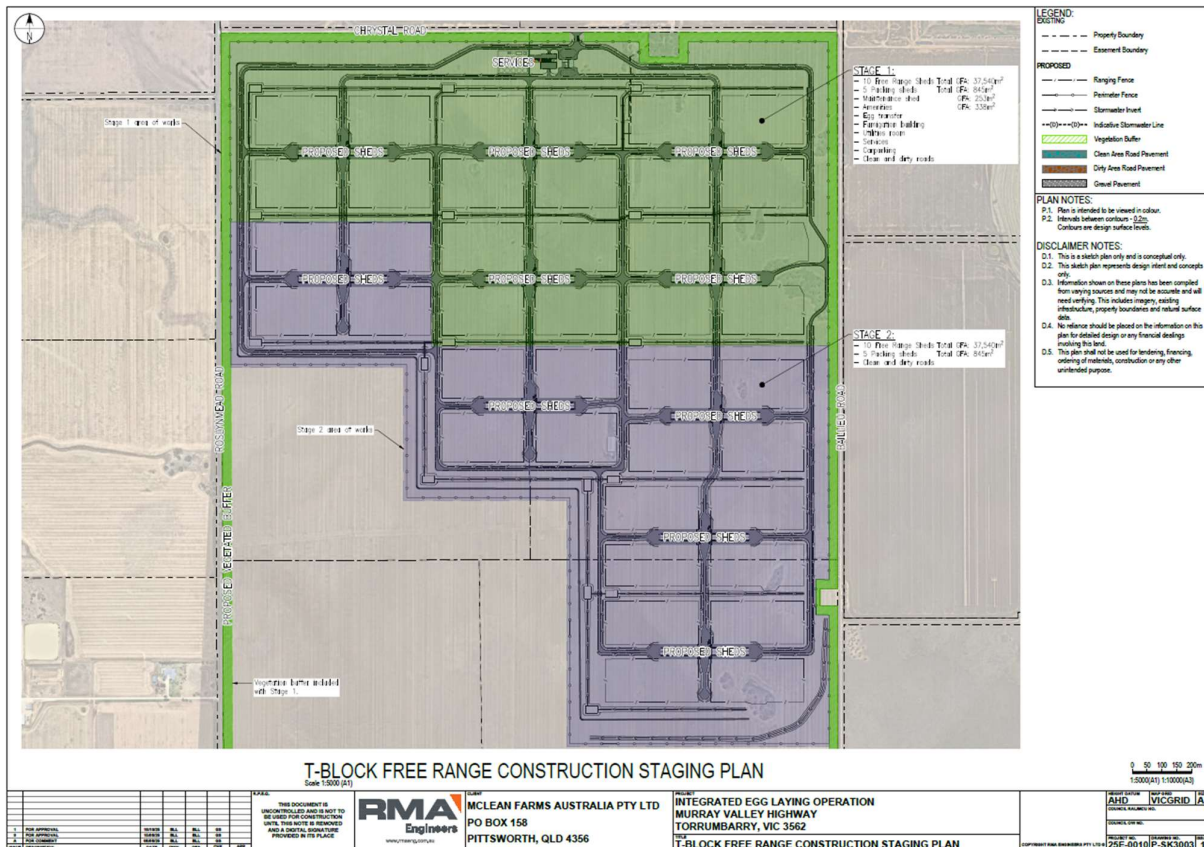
Layer Farm Staging Plan (RMA Engineers, 2025)
